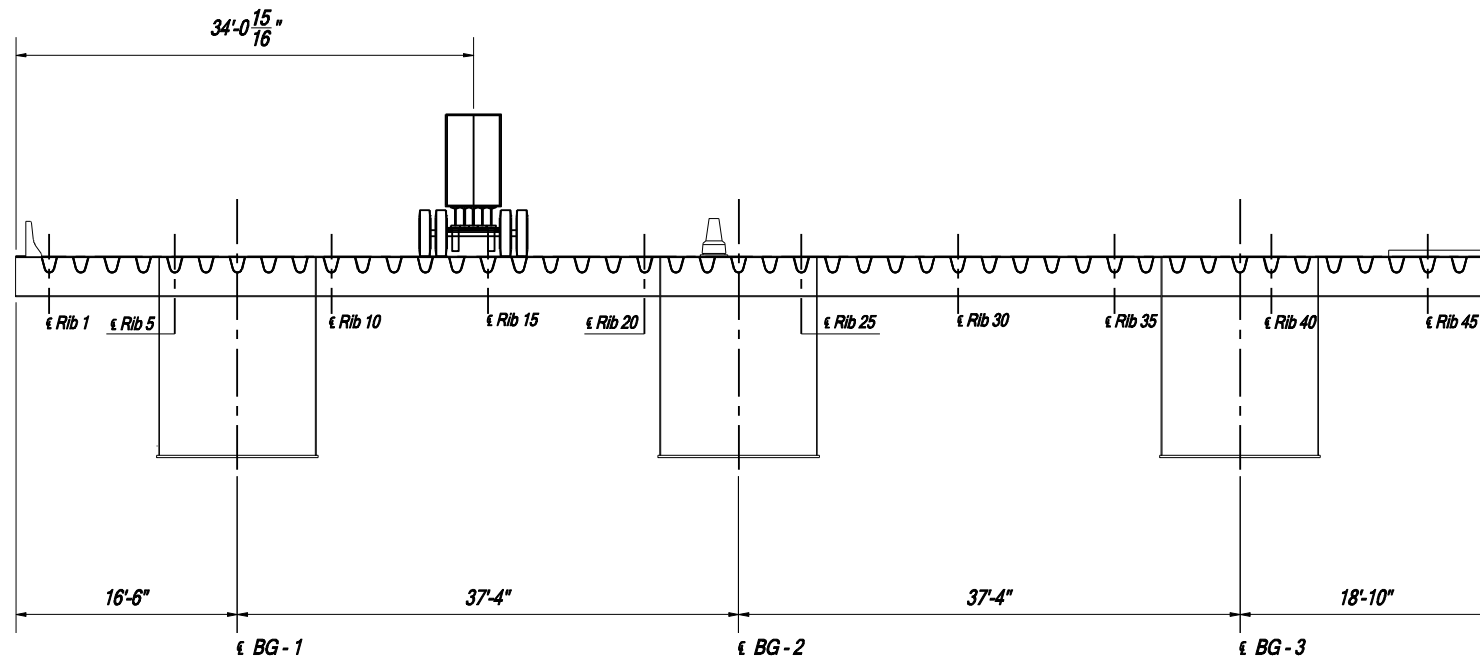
Transverse load position T35 considered for FEA of bridge deck
